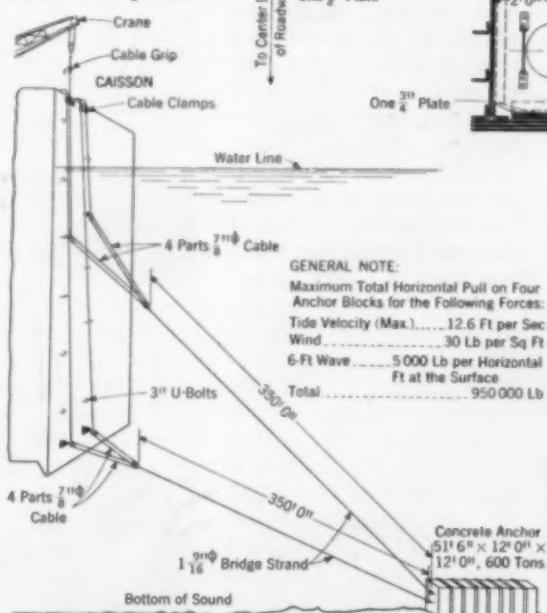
SKETCH OF CAISSON-ANCHOR CONNECTIONS
